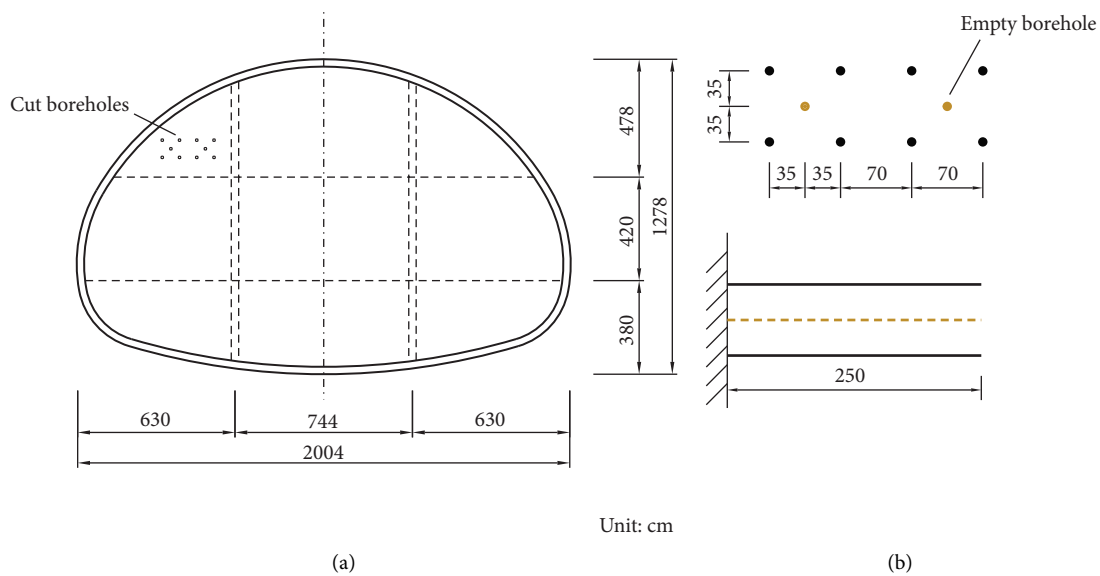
The large cross-sectional tunnel. (a) Different excavation sections of tunnel. (b) Cut boreholes.
